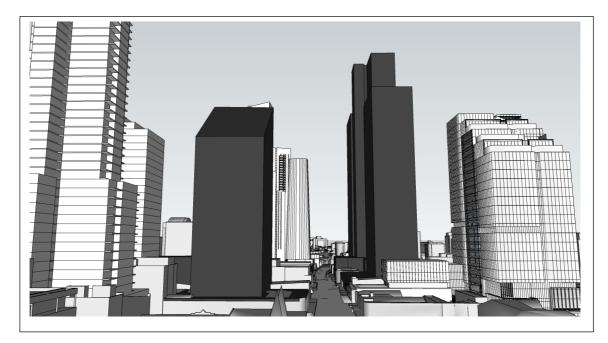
18m upper level (tower) setback - looking north towards the River
